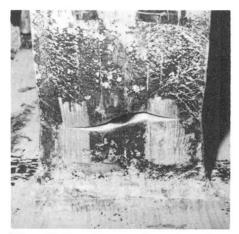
Fracture of Beam Flange in Joint D
